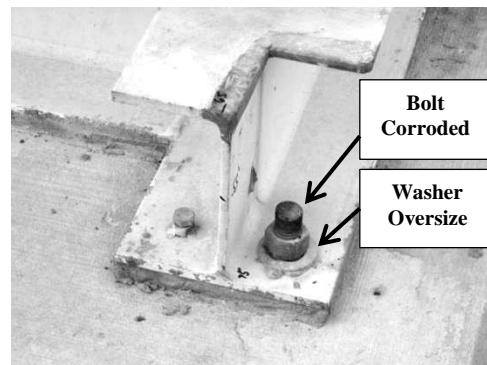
Motor End of Skid, Carbon Steel Anchor Bolts, Over
